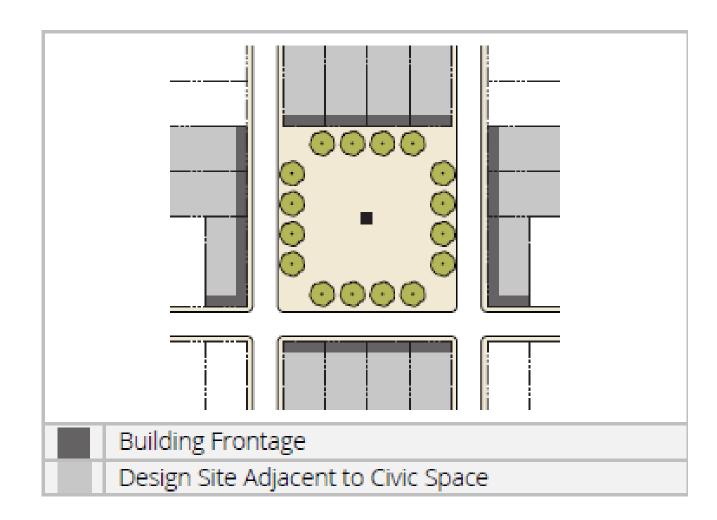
Building Frontage Adjacent to a Civic Space
